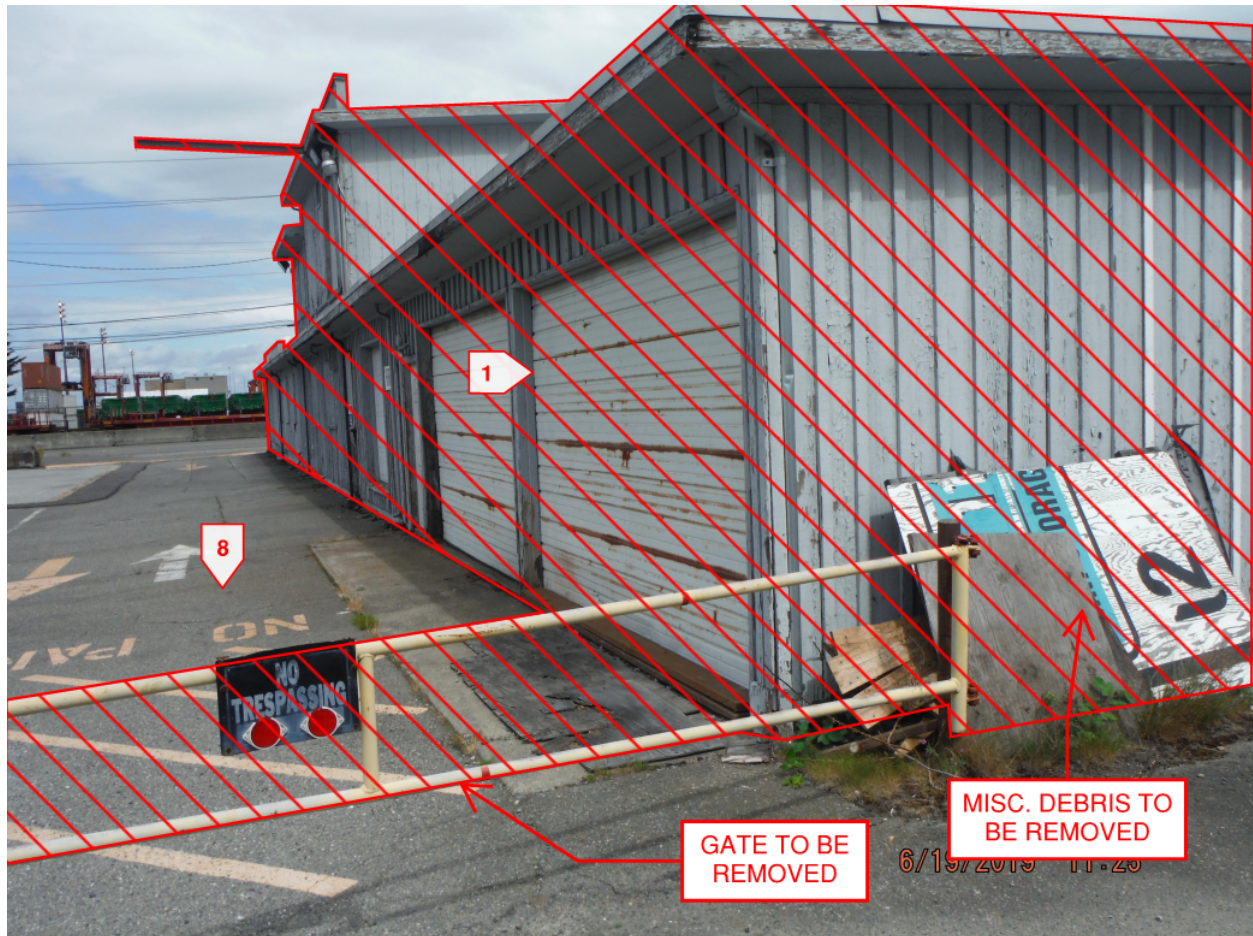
2338 E 11th Street Building Demolition Exterior Photograph
